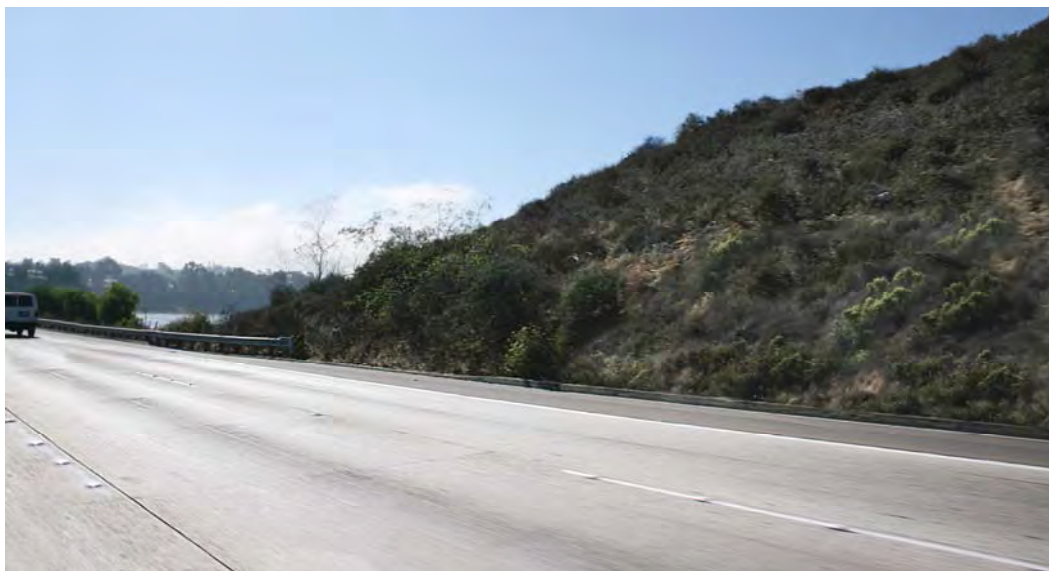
Key View 17 - I-5 at Mission Avenue: Proposed view looking west
